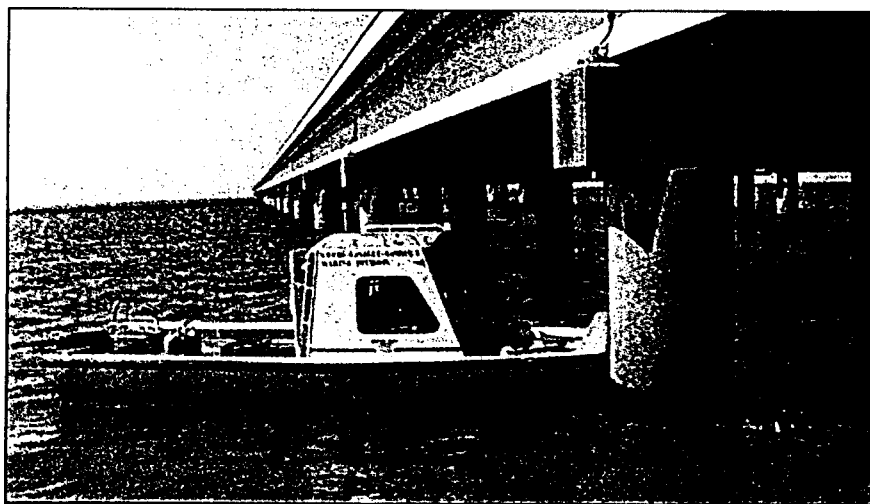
Pilings of the 24-mi. long bridges crossing Lake Pontchartrain
